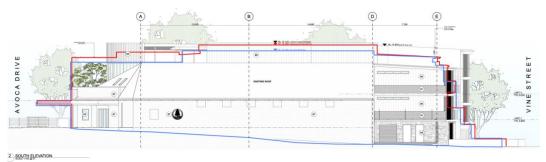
South Elevation – CKDS A2001 Issue 10 – 21/12/2022
